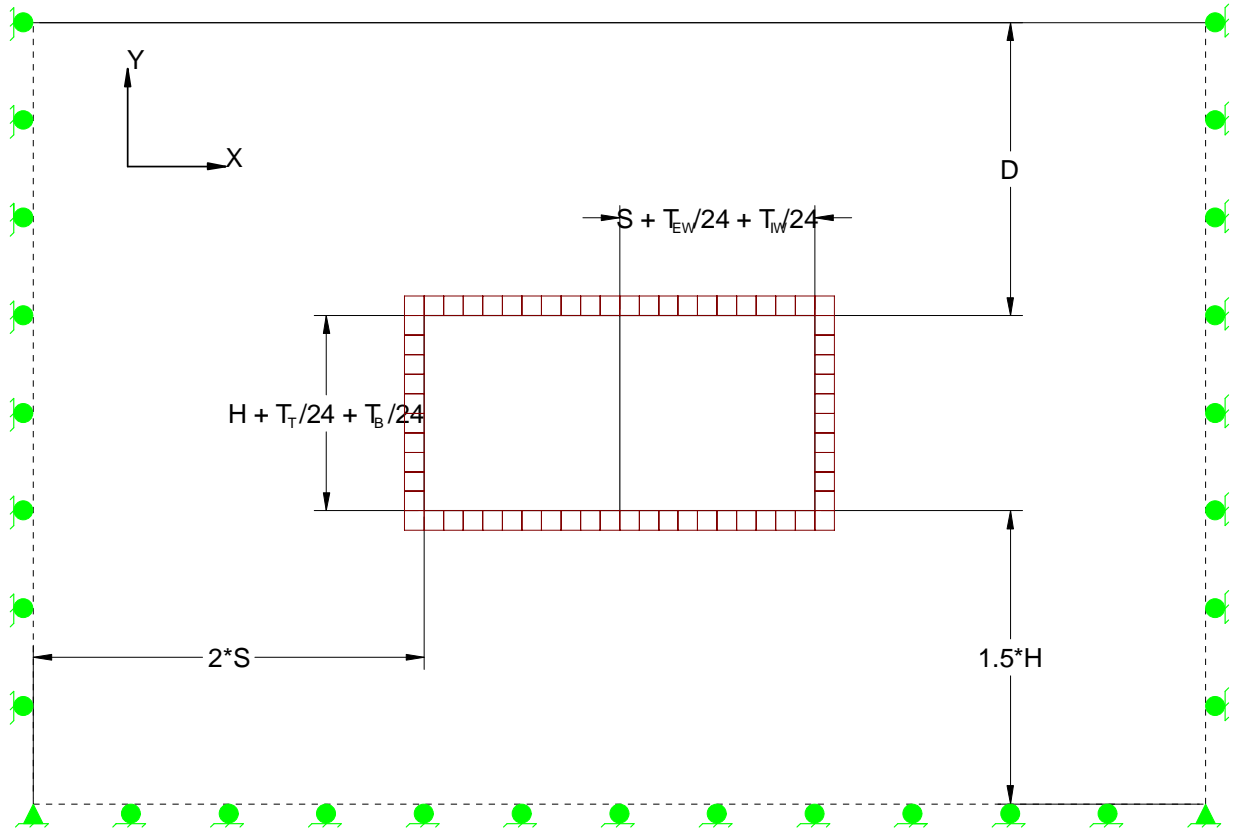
SOIL STRUCTURE INTERACTION MODEL LAYOUT.
